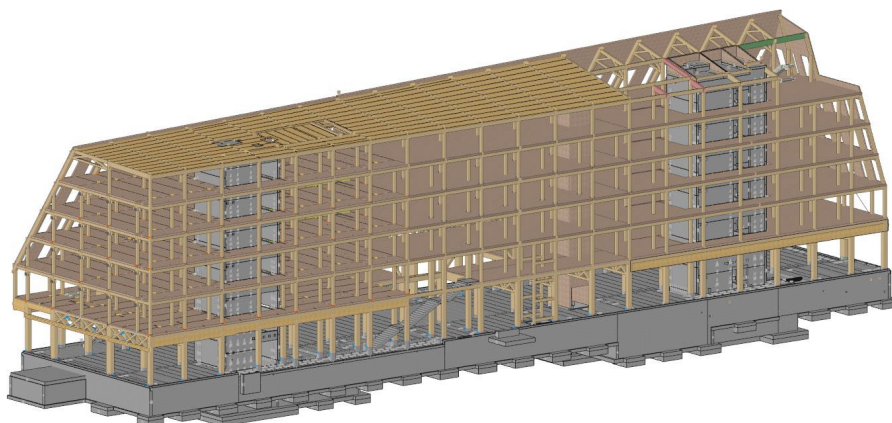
Visualization of the structural system from IFC-models by Binderholz (timber elements), Skanska (cast-in-situ concrete), Starka (precast concrete slabs), and Torps Byggelement (precast concrete walls).
